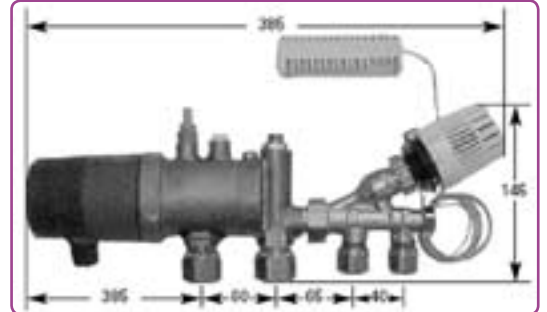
Distance from wall to centre pipe 43 mm. Total build depth 78mm. Radiator circuit connection Ø 15 mm. Underfloor heating loops Uponor-PEX 20 x 2 mm pipe as standard.
